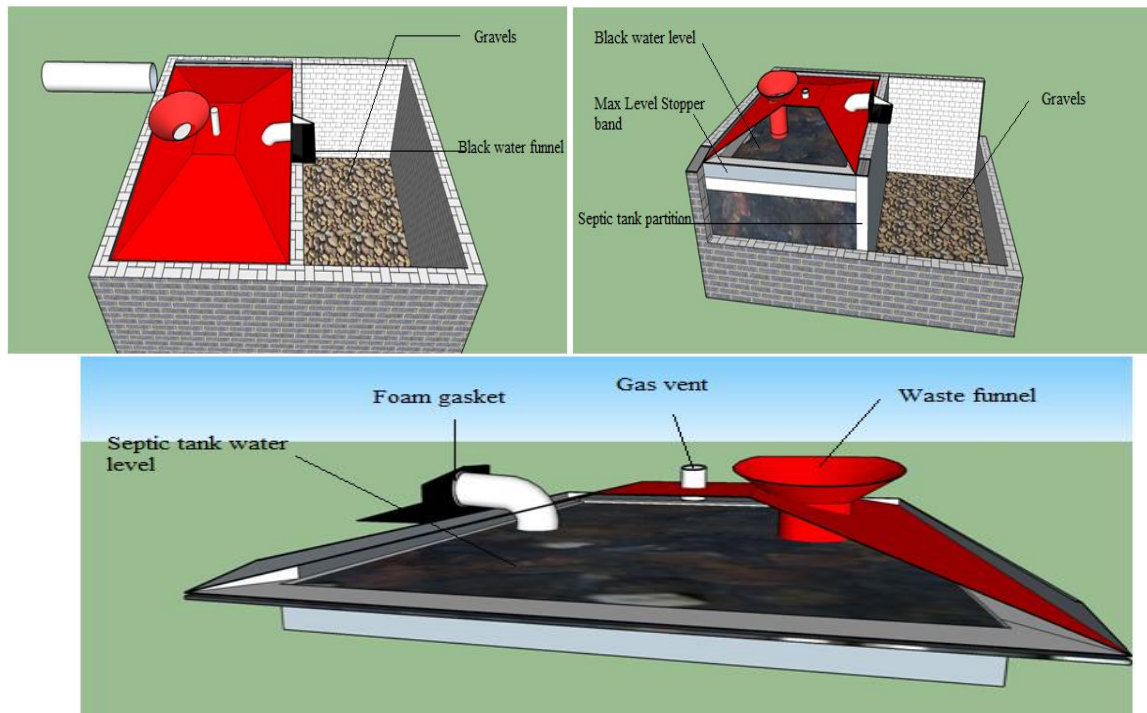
Truncated rectangular gas collector views on septic tank sections for a three bedroom apartment
